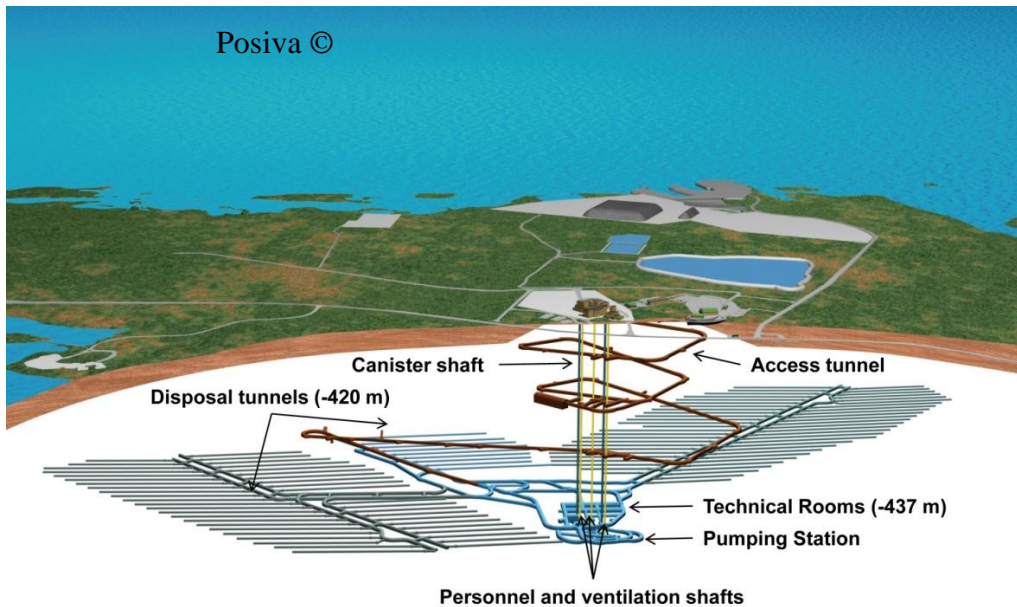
Posiva design for disposal facility. Onkalo URCF consist of access ramp, three shafts and central auxiliary rooms.
